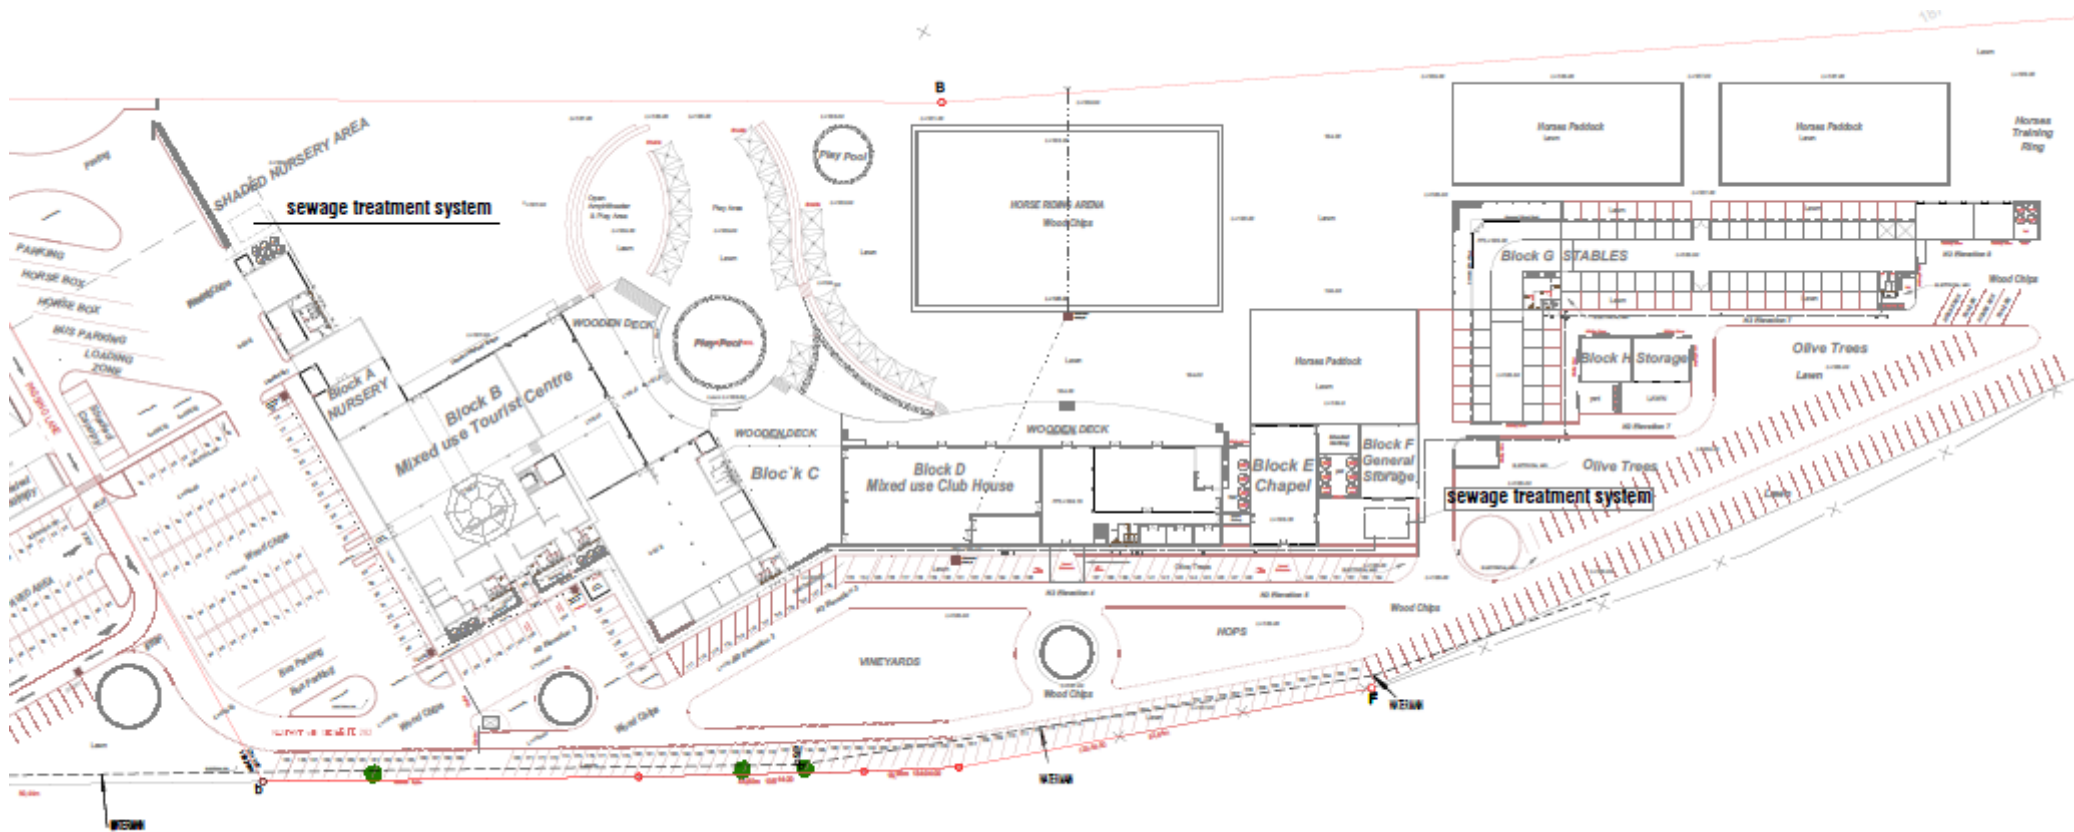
Site Development Plan (SDP) for the proposed Garden Route Gateway Plaza
